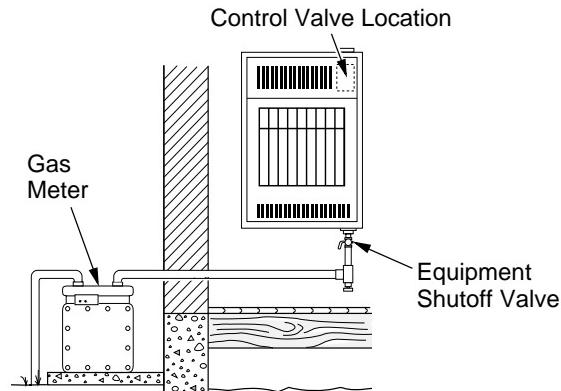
Checking Gas Joints for Natural Gas [6,000 Btu/Hr Model (1.8 kW) Shown]
